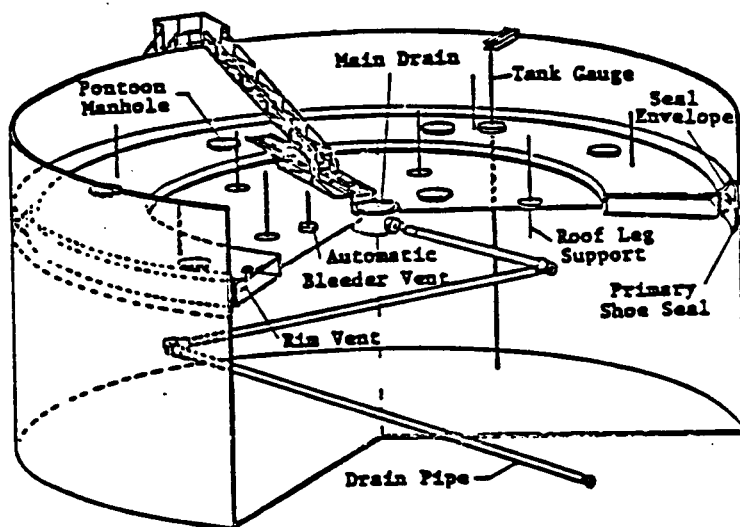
External floating roof tank.<sup>1</sup>
